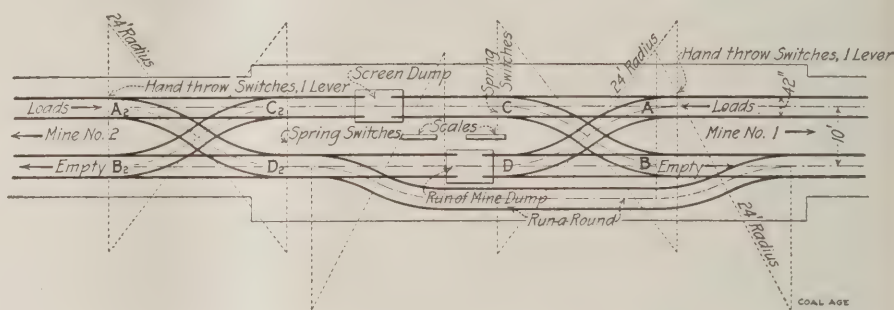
TRACK PLAN, SHOWING TWO DUMPS AND ARRANGEMENT OF SWITCHES
